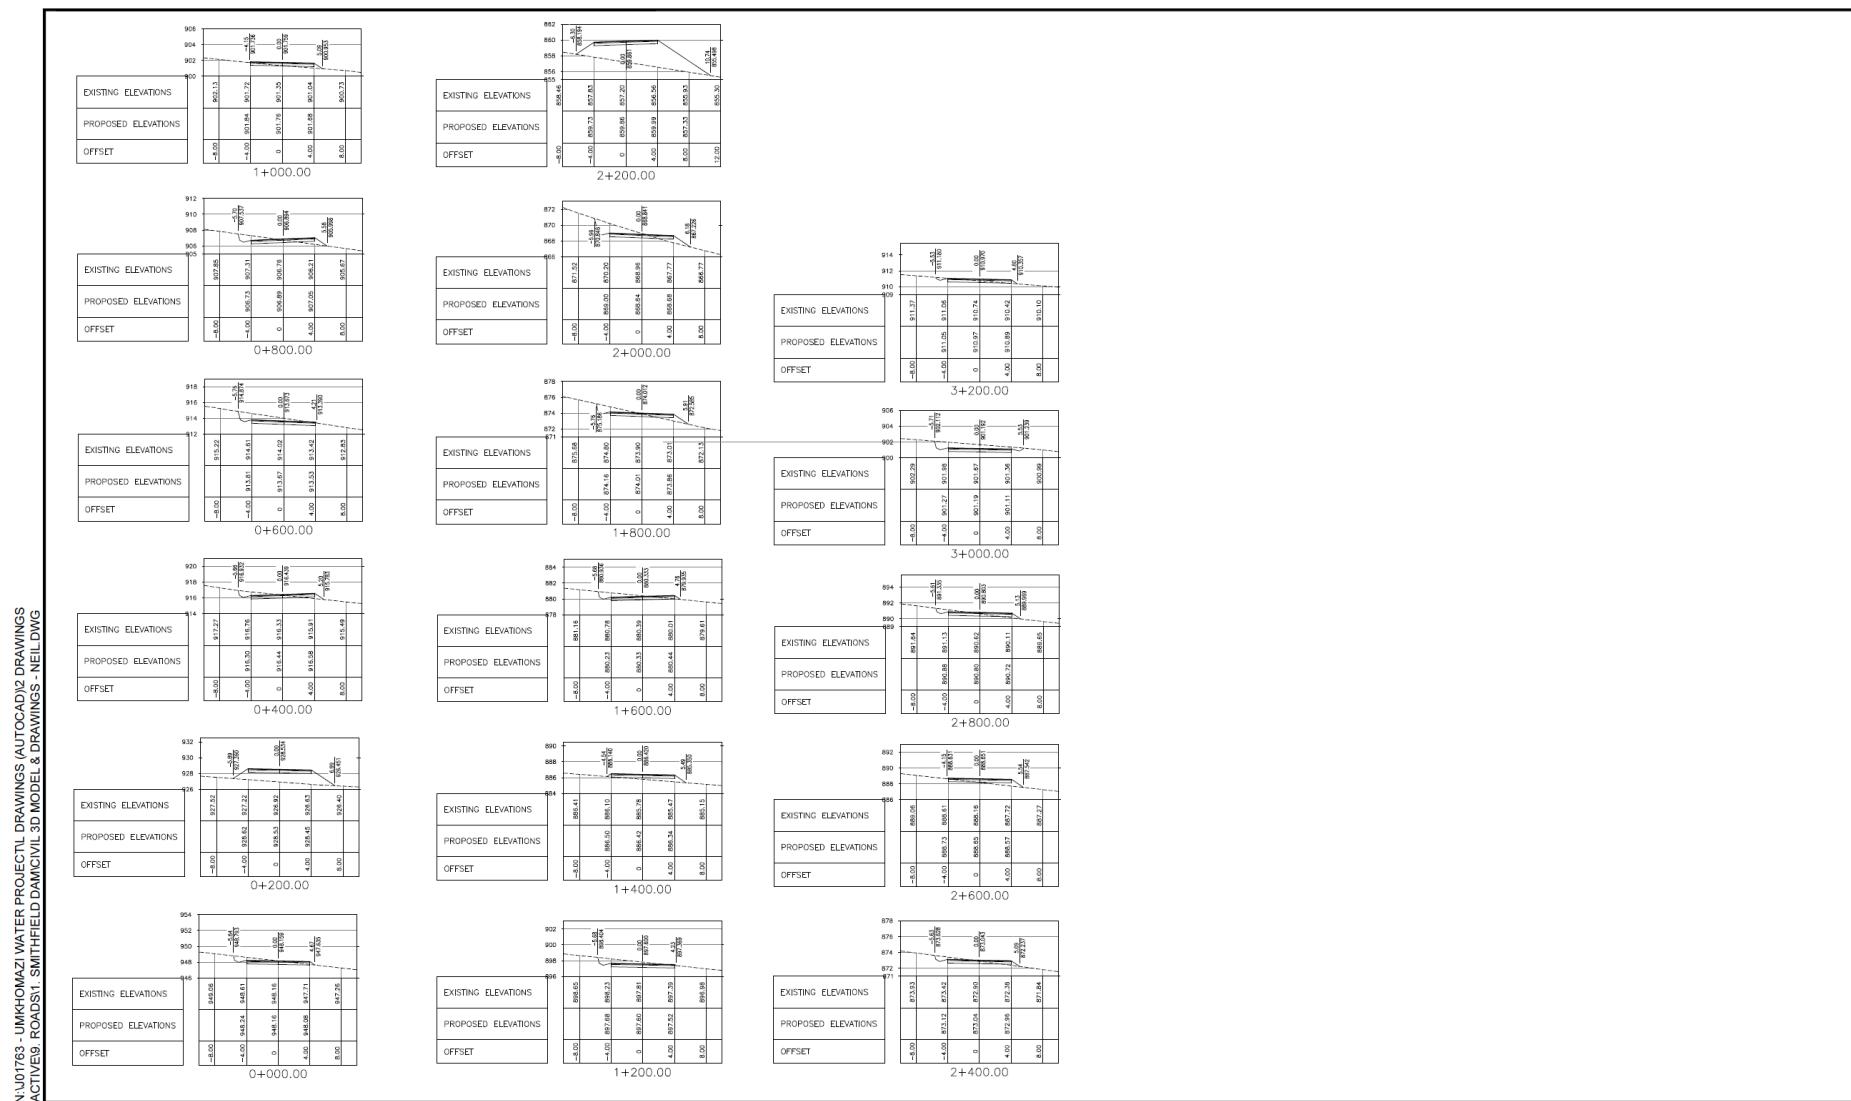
C.8: Smithfield Dam – Cross sections of construction road
